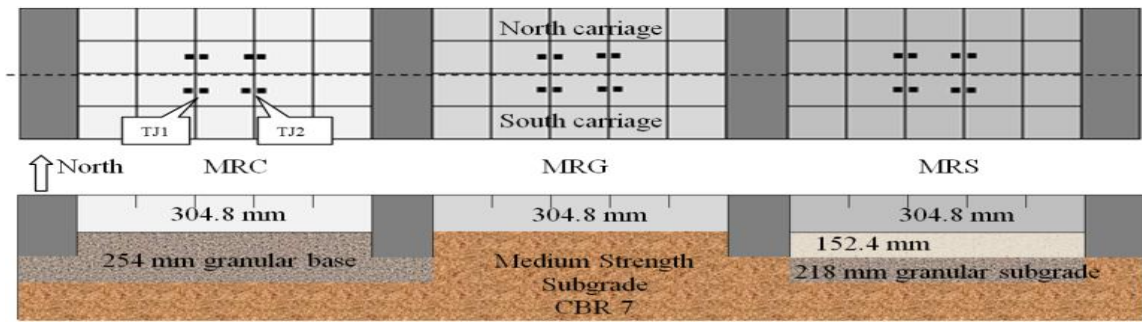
Plan and sectional view of CC2 test items with position of concrete strain gages used in this study (Cunliffe et al., 2012)
